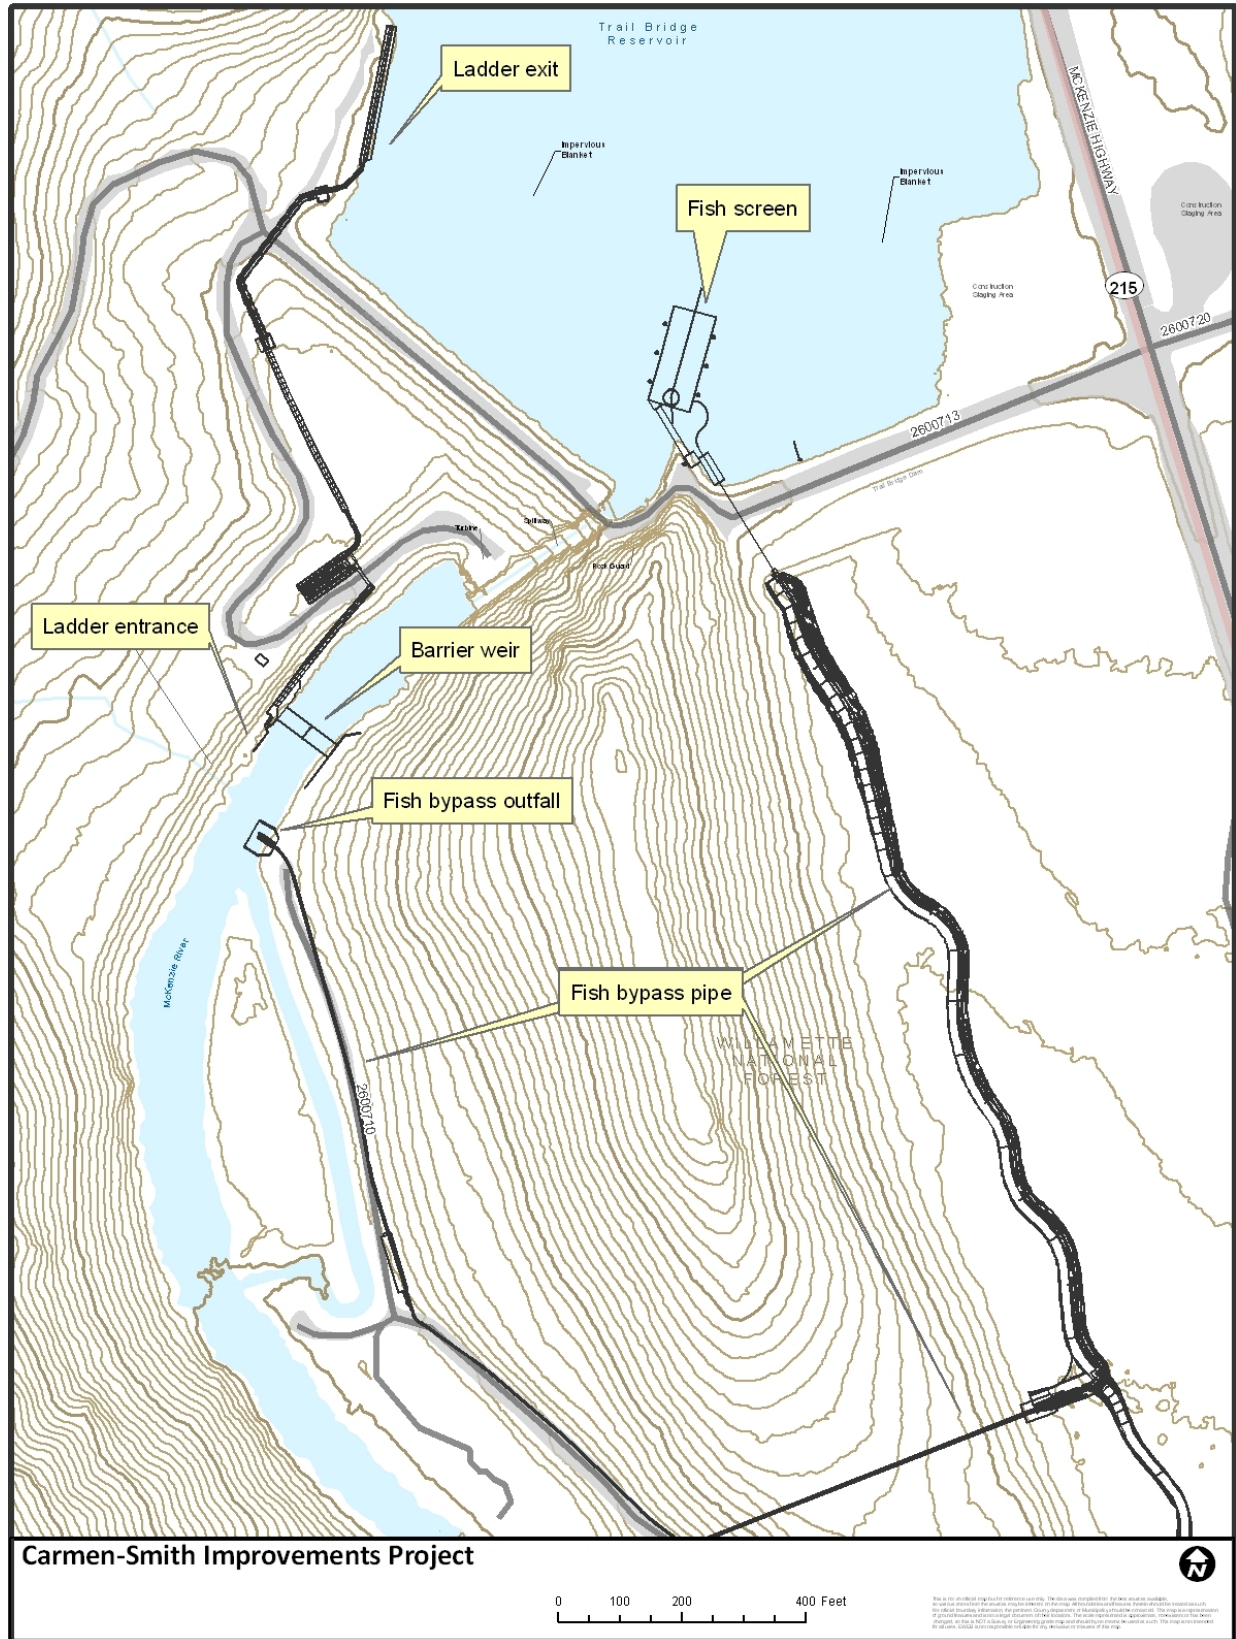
Trail Bridge Dam Fish Passage Facilities (Courtesy of EWEB)
